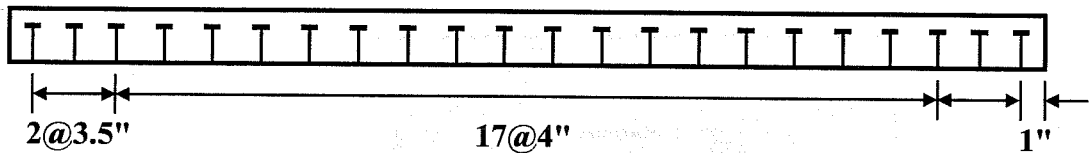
Concrete Stiffener Reinforcement and Measured Dimensions
